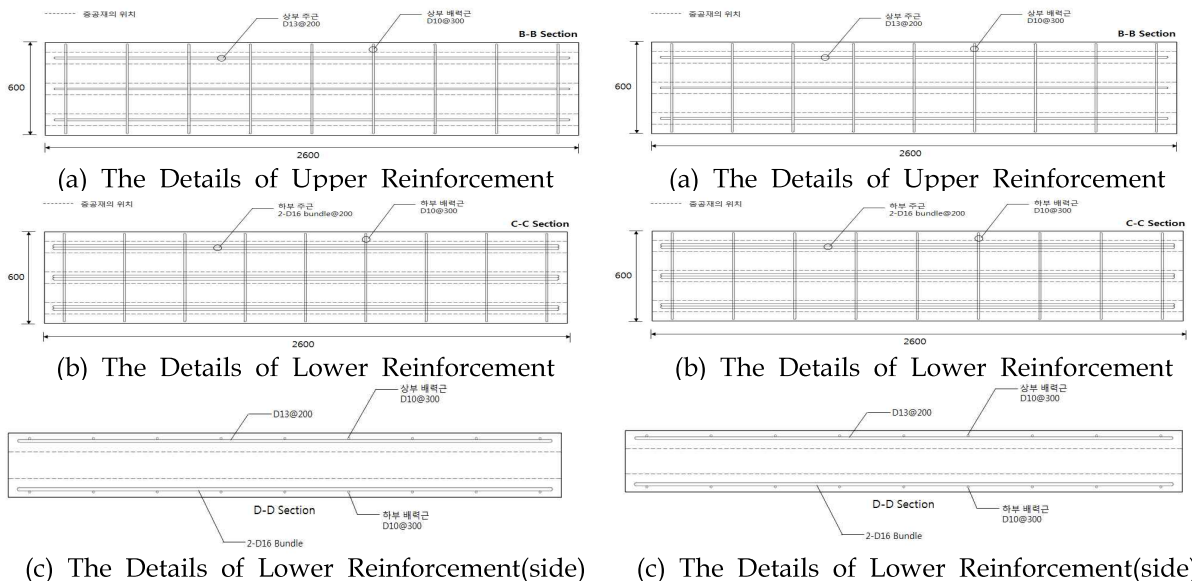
The Reinforcement of Bending Test Specimen Fig. 7. The Reinforcement of Shear Test Specimen
